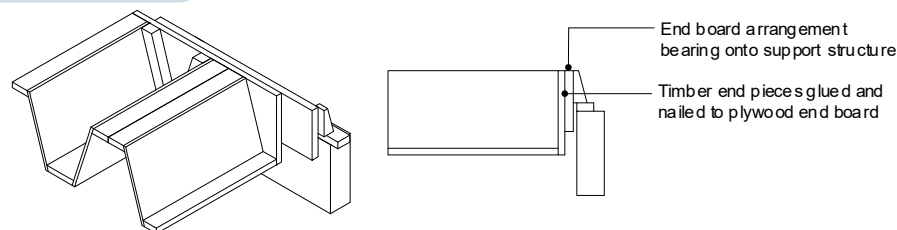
Example of 'Trofdek' folded plate timber roof bearing support
